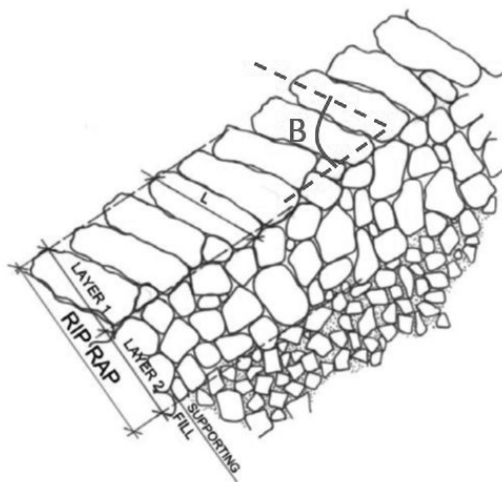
Diagram showing the arrangement of placed riprap according to a typical cross-section, adapted from (Lia, Vartdal, Skoglund, & Campos, 2013)
